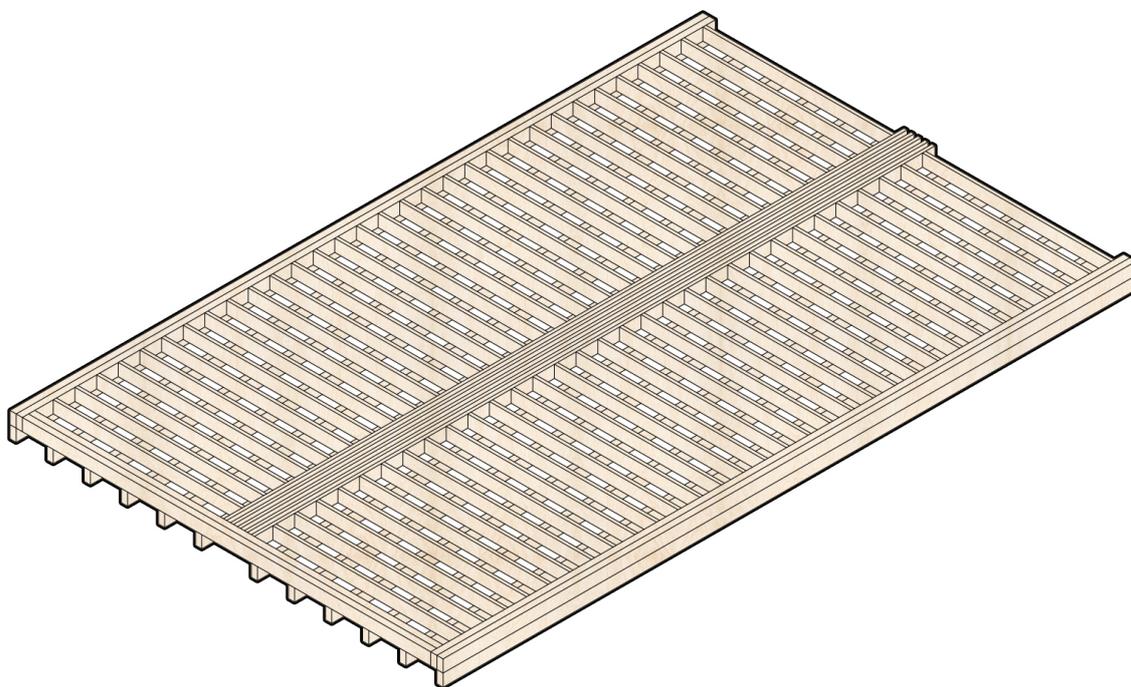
Construction stage 1 placing plenty timber on surface to form hut of foundation. Original author
